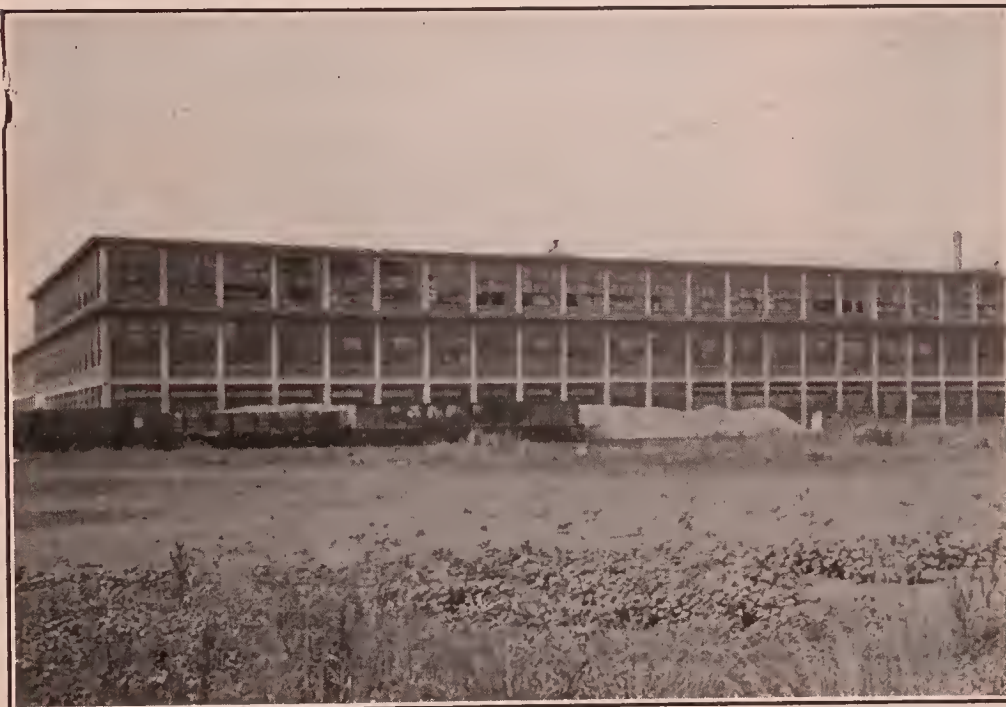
Exterior Elevation of Pierce-Arrow Body Building
